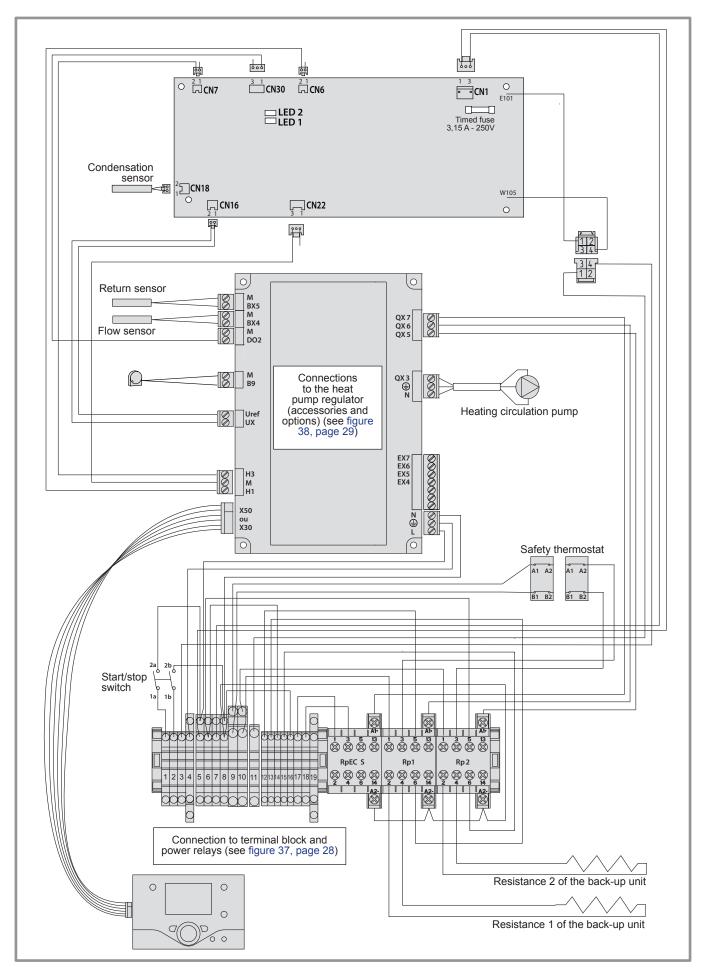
Electrical wiring, Hydraulic module (Except installer's connections)
